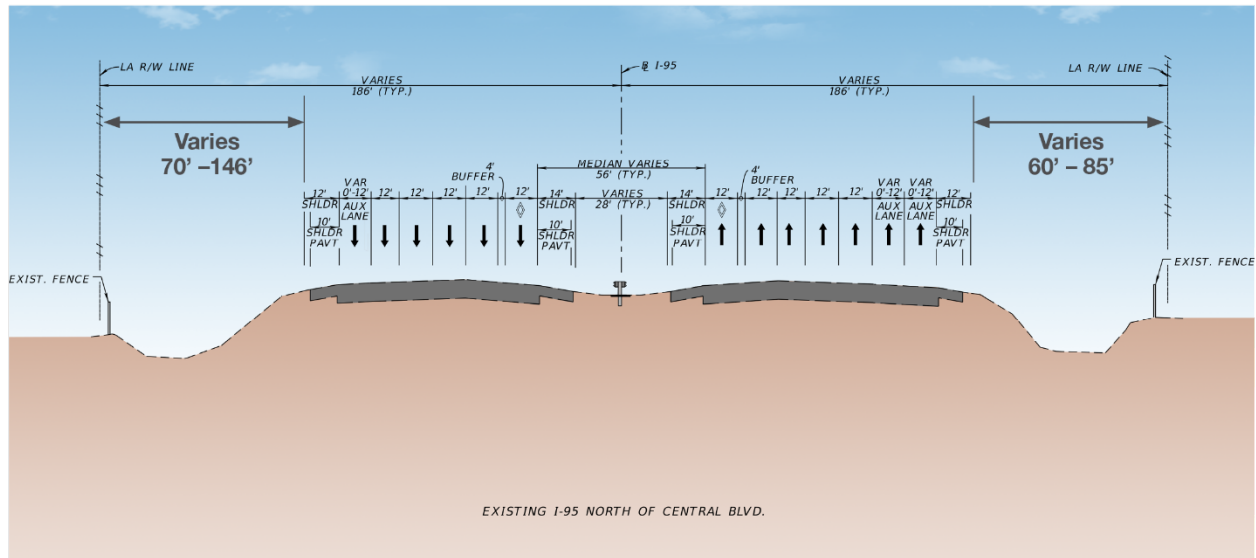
Existing I-95 Roadway Typical Section – North of Central Boulevard
